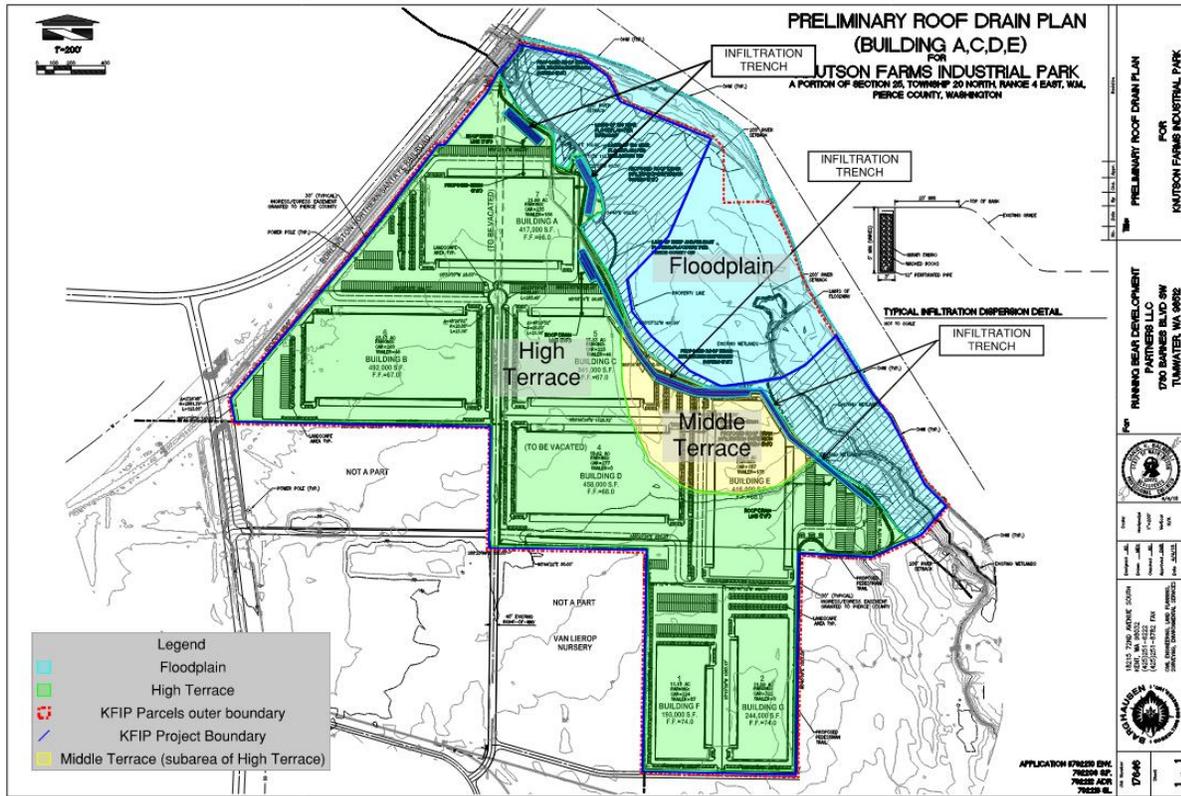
Adapted from Preliminary Roof Drain Plan, Showing Potential Infiltration Areas and Proposed Infiltration Trench Locations at the Outer Edge of the High Terrace.
